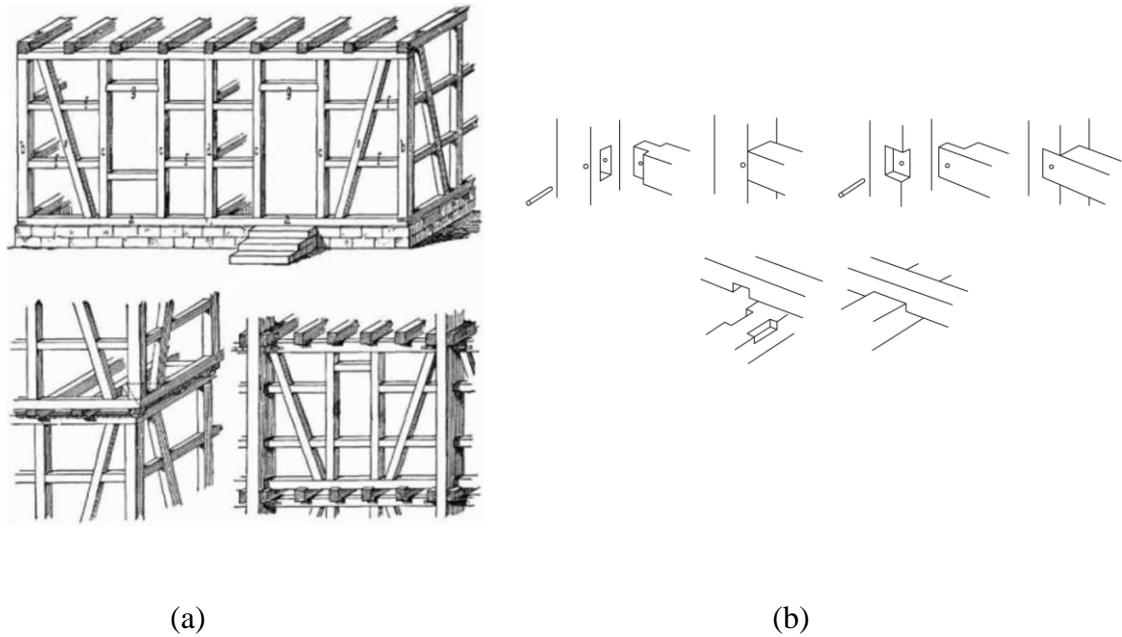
2: The fachwerk system (a), mortise-tenon, halving, cross-cut lap joints (respectively) (b)
